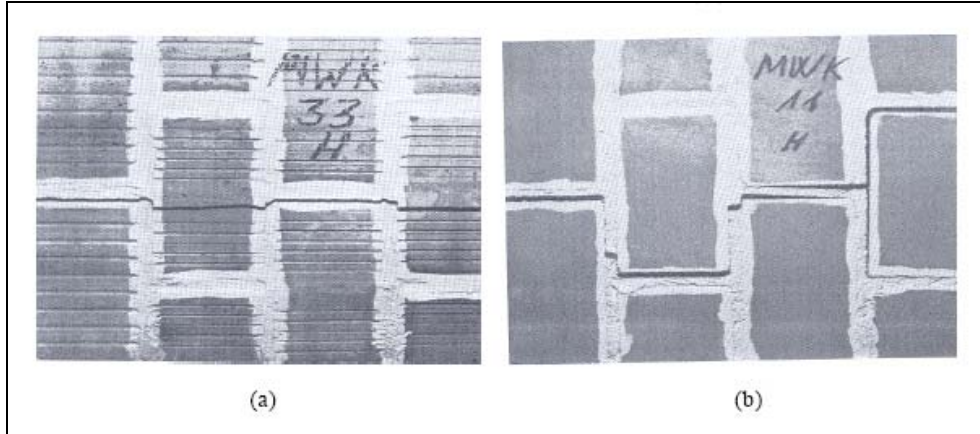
Modes of tension failure of masonry walls under direct tension, from Backes (1985): through type (a), zigzag type (b).
